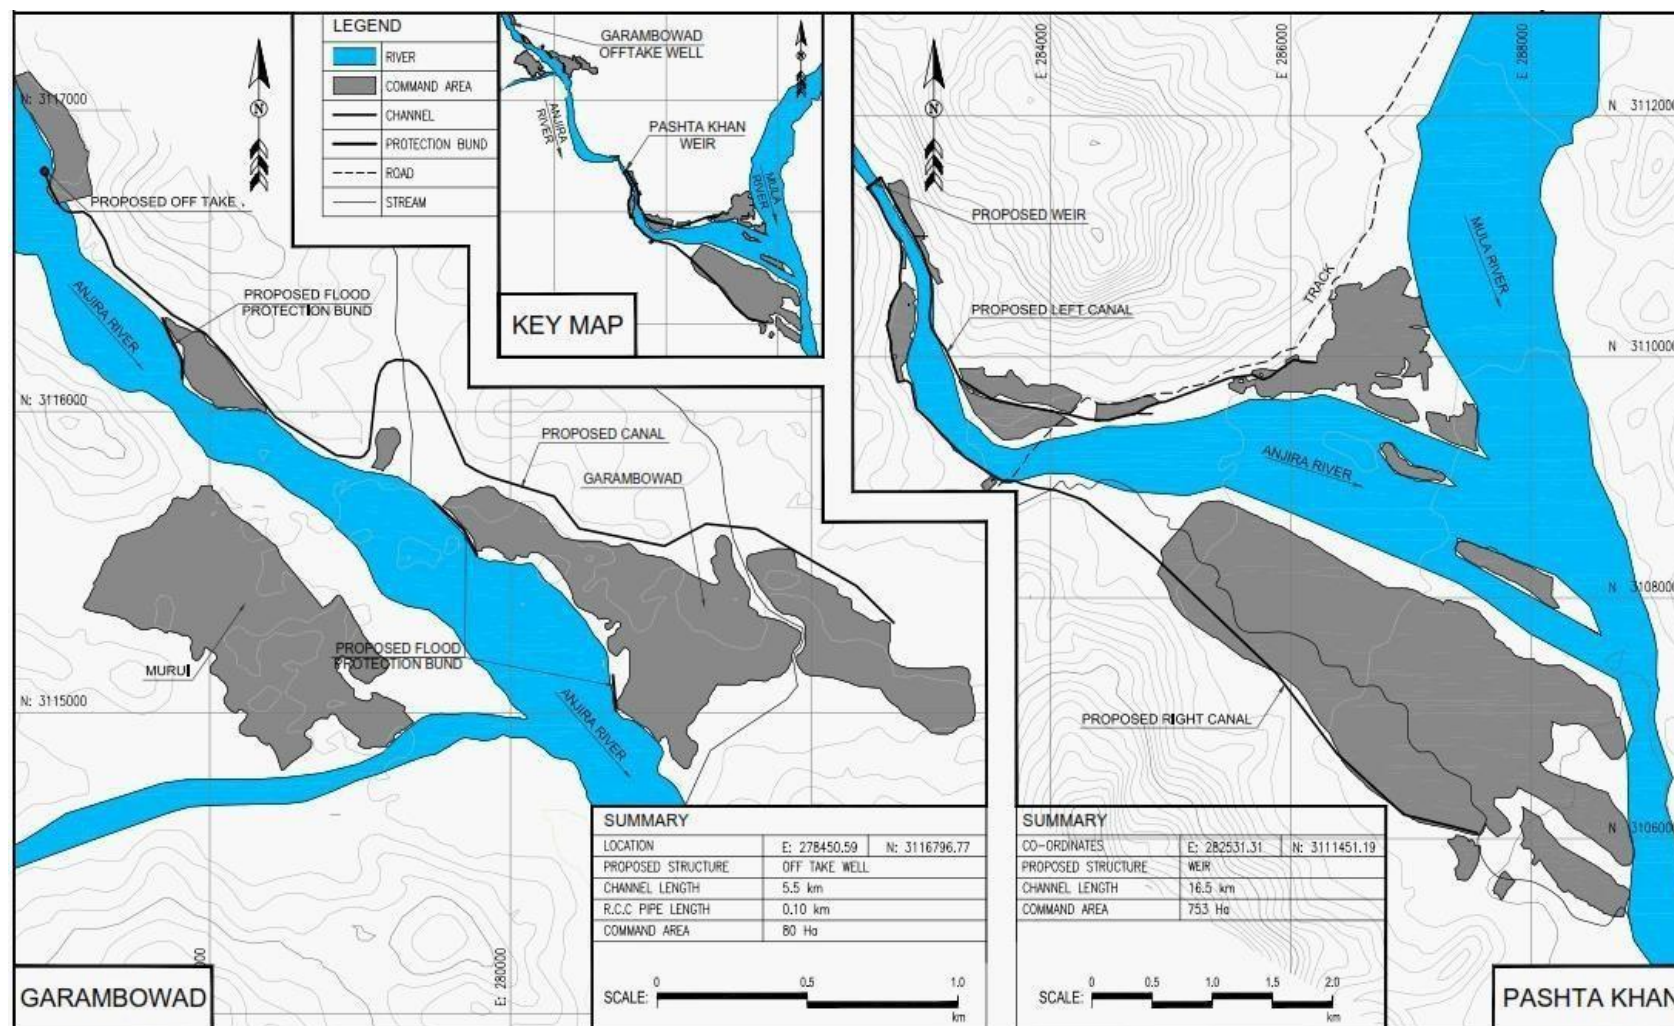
Pashta Khan and Garambowad perennial irrigation sub-project – layout plan
